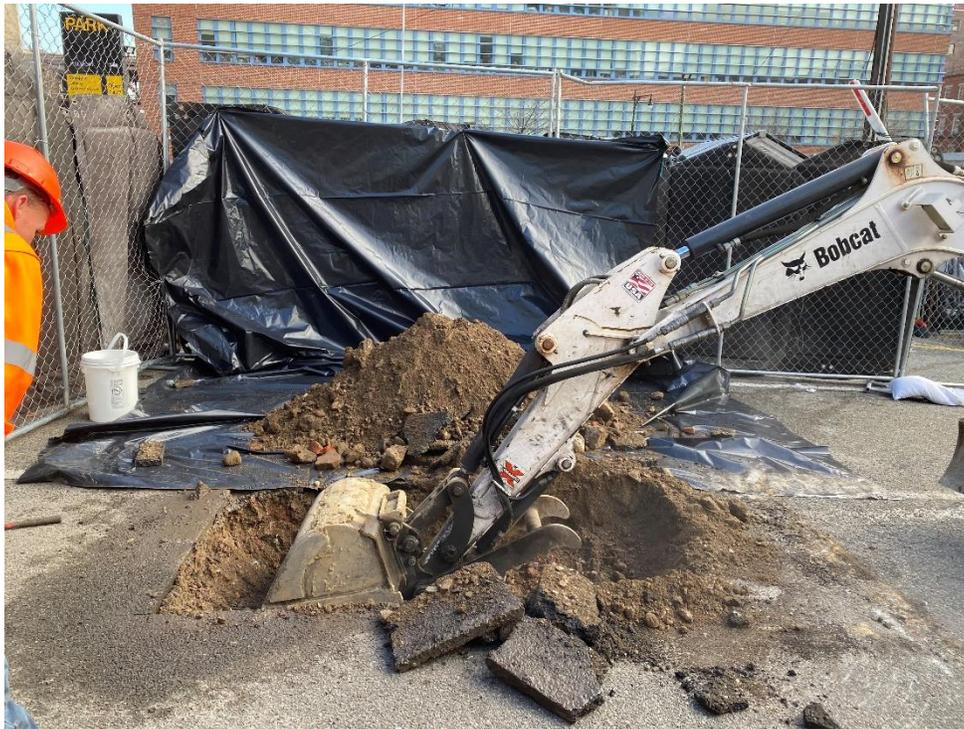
View of AARCO excavating test pit TP01 (facing east) (02/12/2022)
